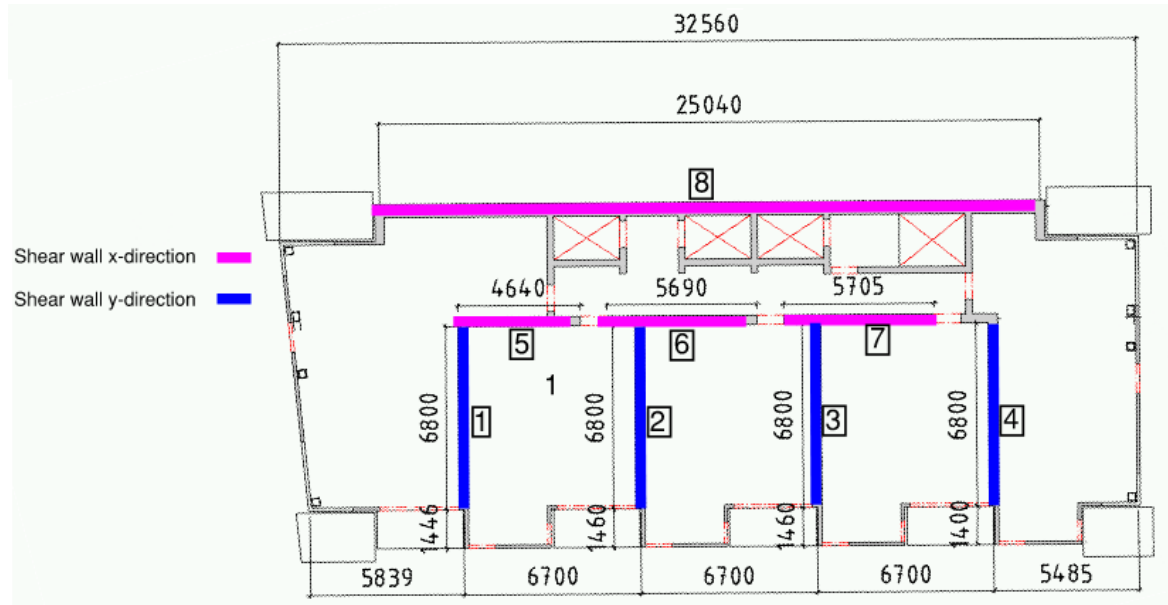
Floor plan with marked shear walls in x and y-direction.
